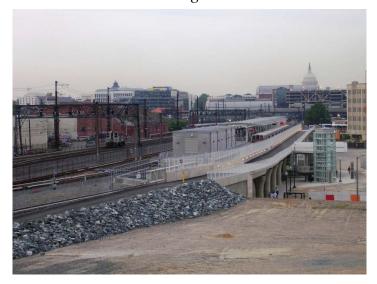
New York Avenue Metro Station and Metropolitan Branch Trail
